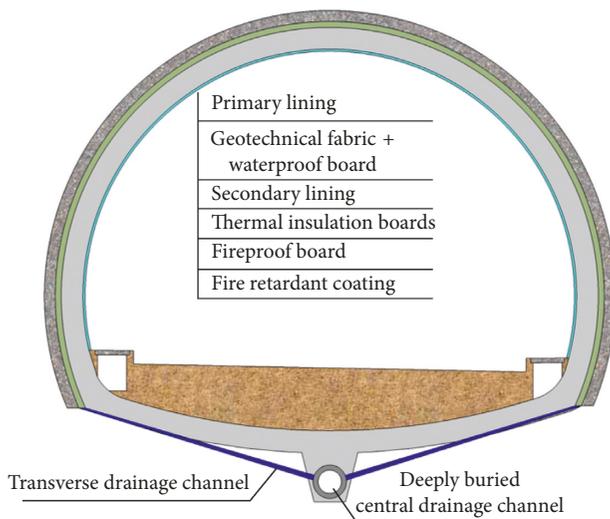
Tunnel lining, thermal insulation layer, and drainage.
